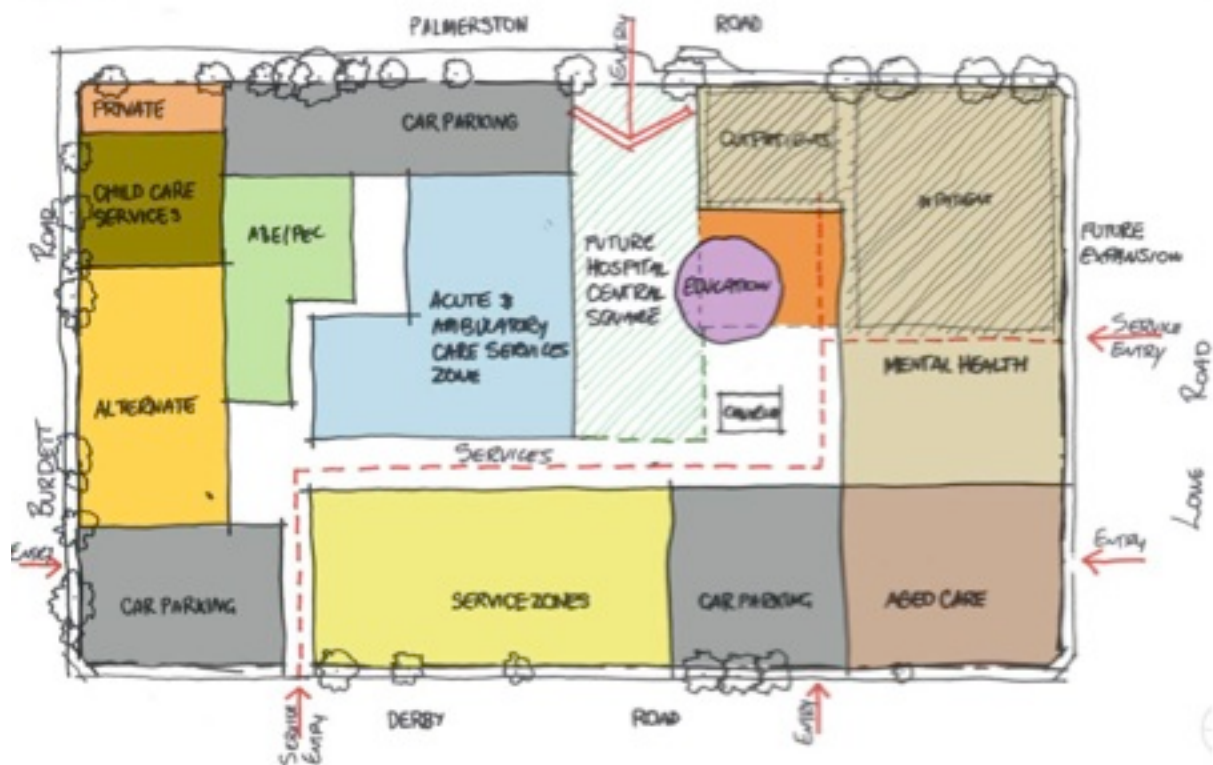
Showing site zoning as part of the master plan in the Site Strategic Plan 1995
